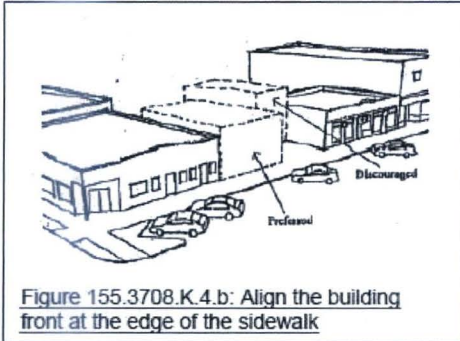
K.4.b: Align the building front at the edge of the sidewalk
